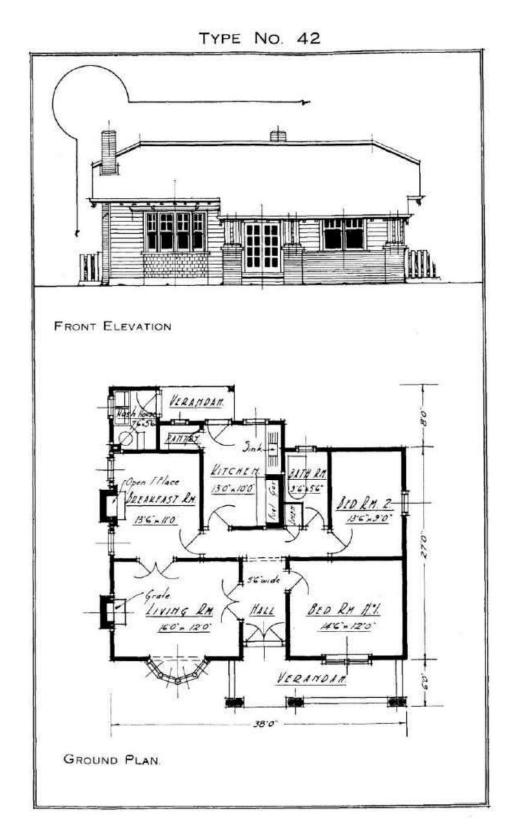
Showing the 1927 State Savings Bank Type No 42 standard plan, the design of the subject building, which was built in the period 1929-34. (Source: State Savings Bank of Victoria 1927:45)
